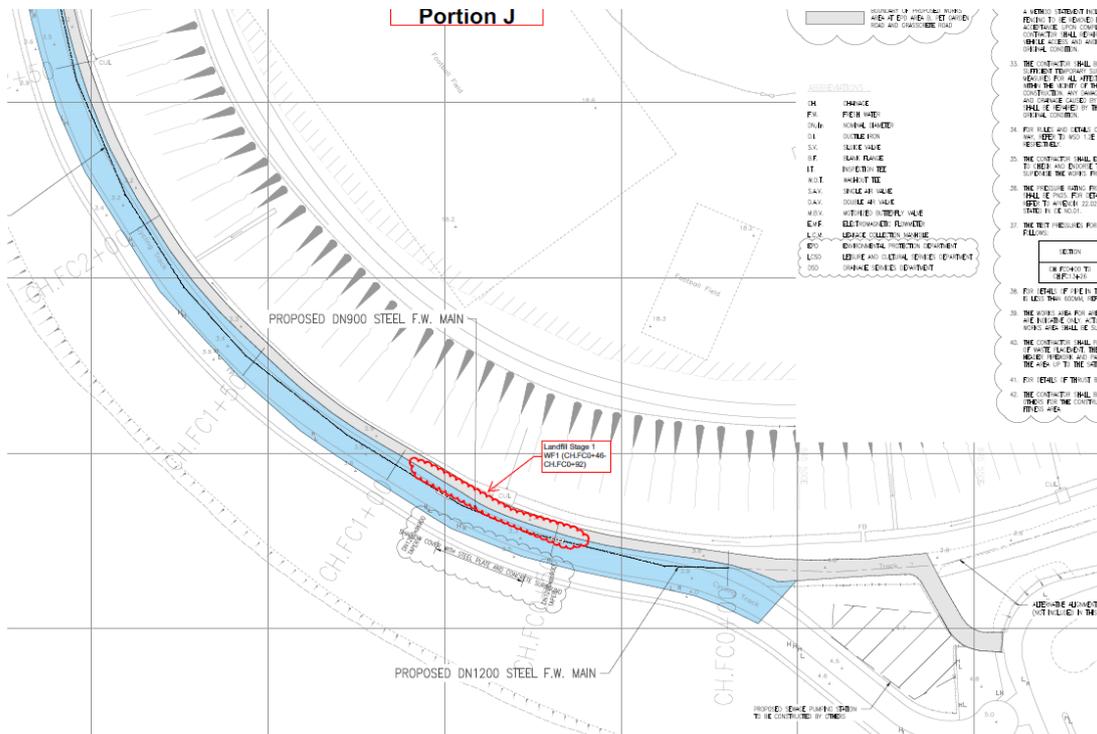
Location Plan – Landfill Stage 1 (Area FC0+42 -FC0+92)
